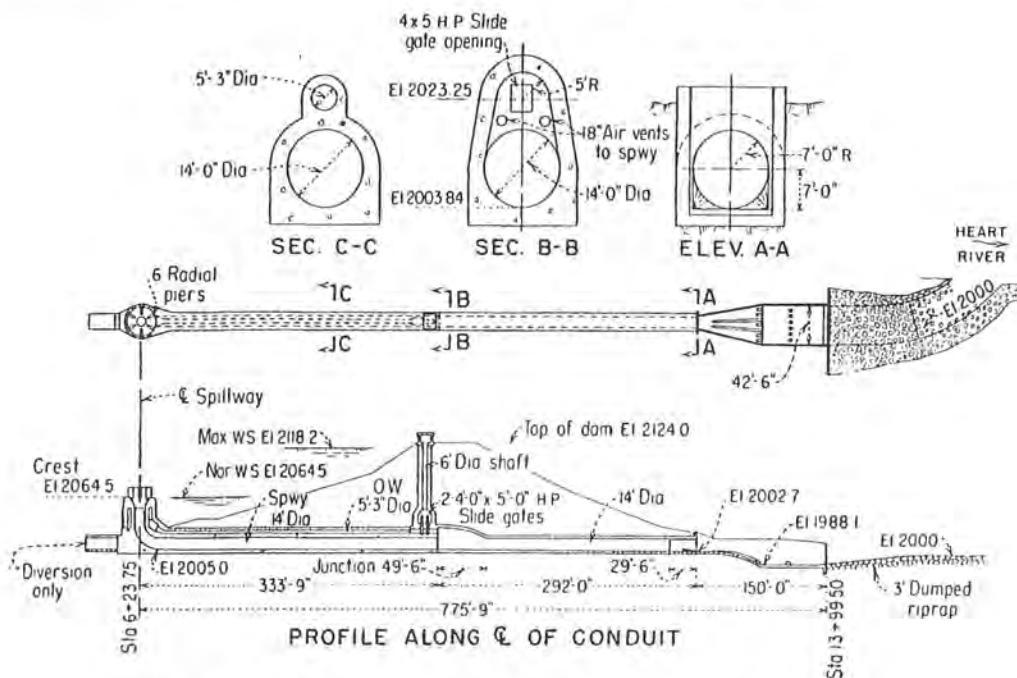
GENERAL PLAN AND SECTIONS FOR SPILLWAY AND OUTLET WORKS
